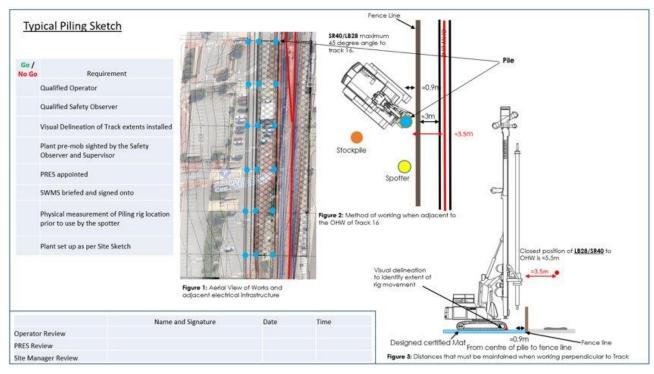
Example of Piling Daily check sheet to be completed prior to commencement of works
